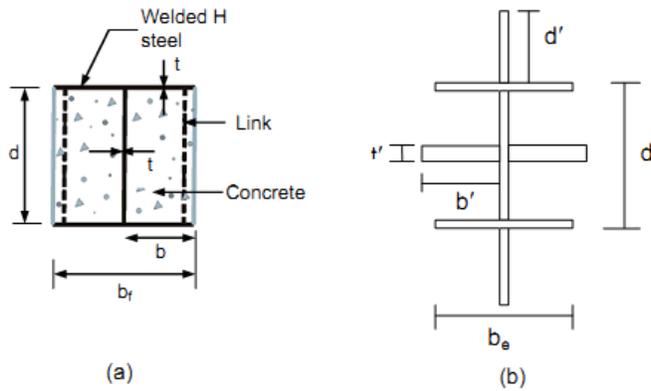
Equivalent steel section for PEC column, (a) Actual cross-section, (b) Equivalent steel section
